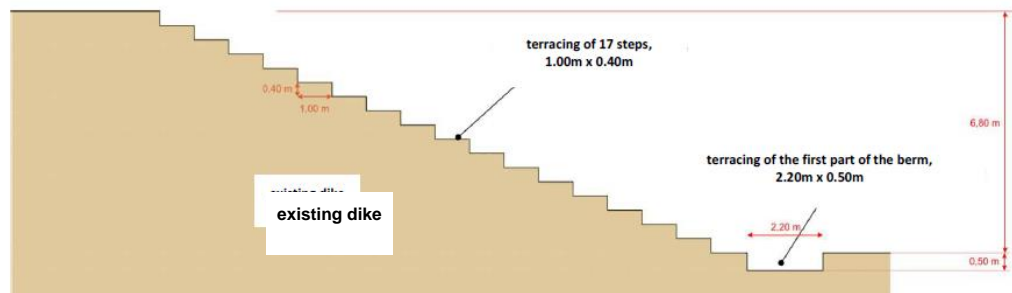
Construction methodology: stage 1: constructing the existing earthenwork steps.
